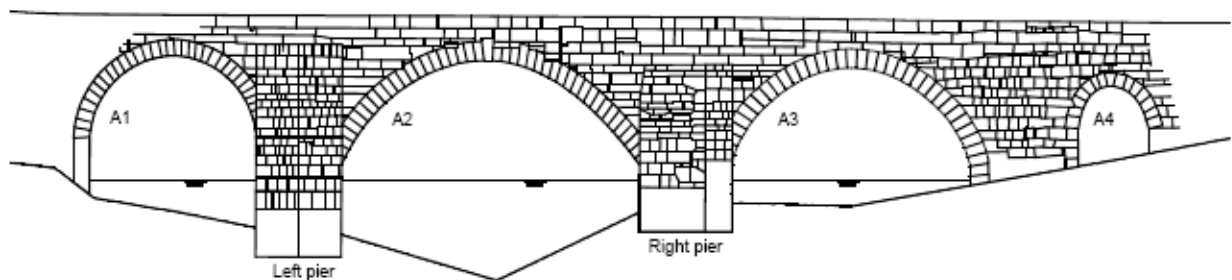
Donim Bridge Elevation; upstream side. (Oliveira, 2004)
